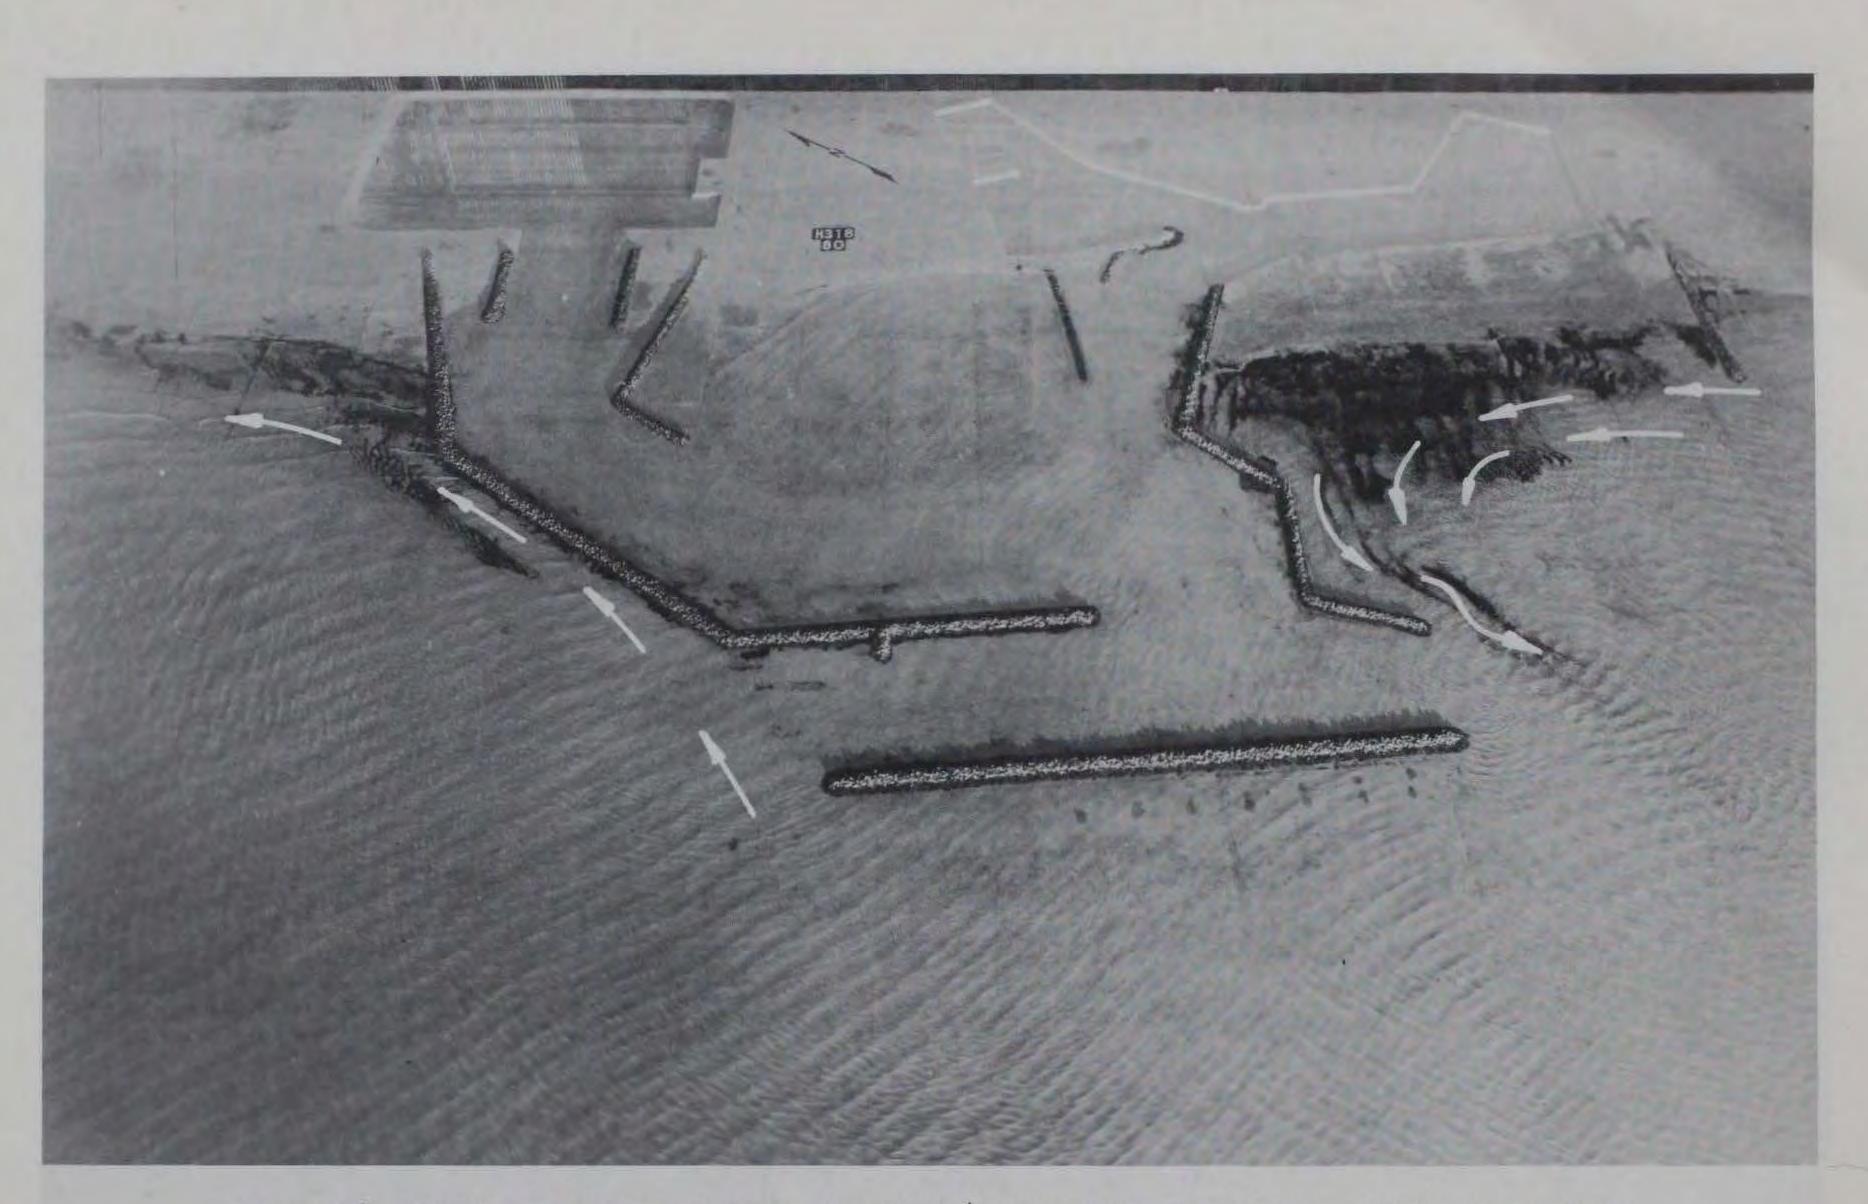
Typical tracer movement for Plan 4 resulting from 9-sec, 10-ft waves from south at mllw
